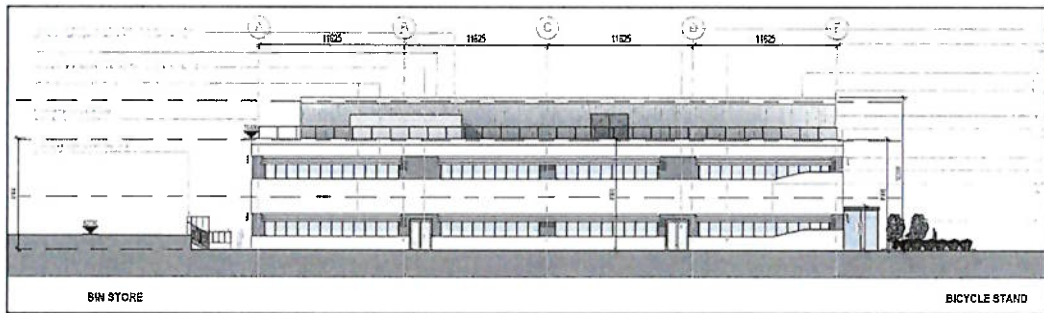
Proposed SASC southern elevation (Pascall + Watson, 2023).
